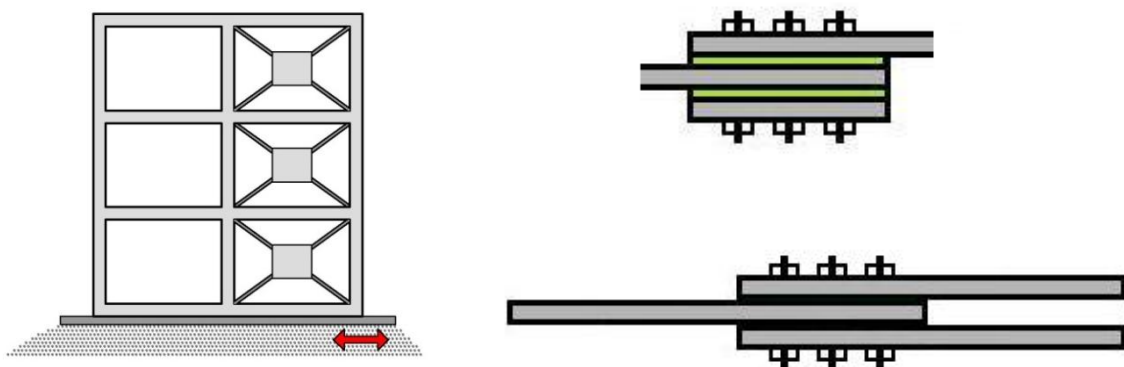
Typical Application of Friction Dampers (left); possible arrangements of Steel Plates in Friction Dampers [3]
